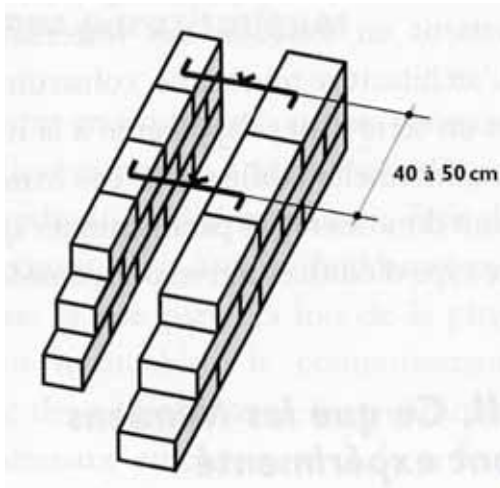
double facing walls tied with metallic ties (ZACEK, 1996)
